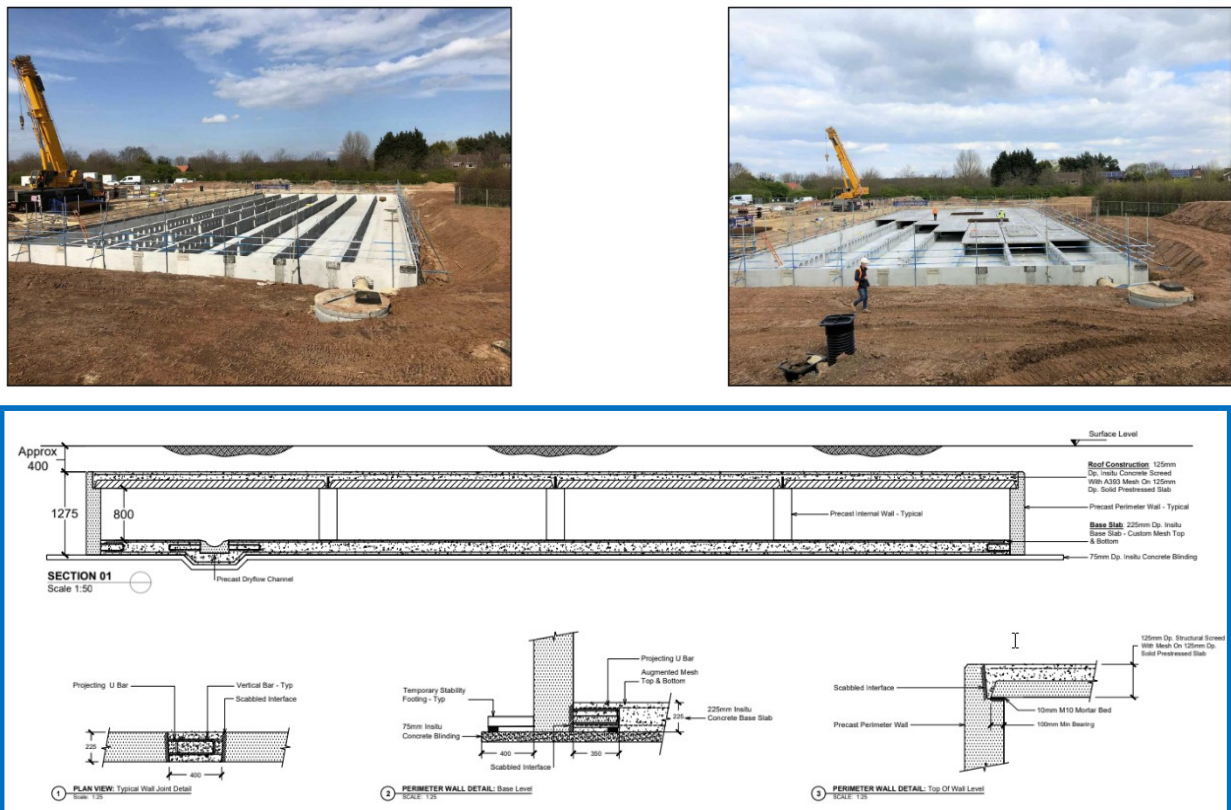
Attenuation RC tanks -typical installation & cross section (Carlow tanks)
